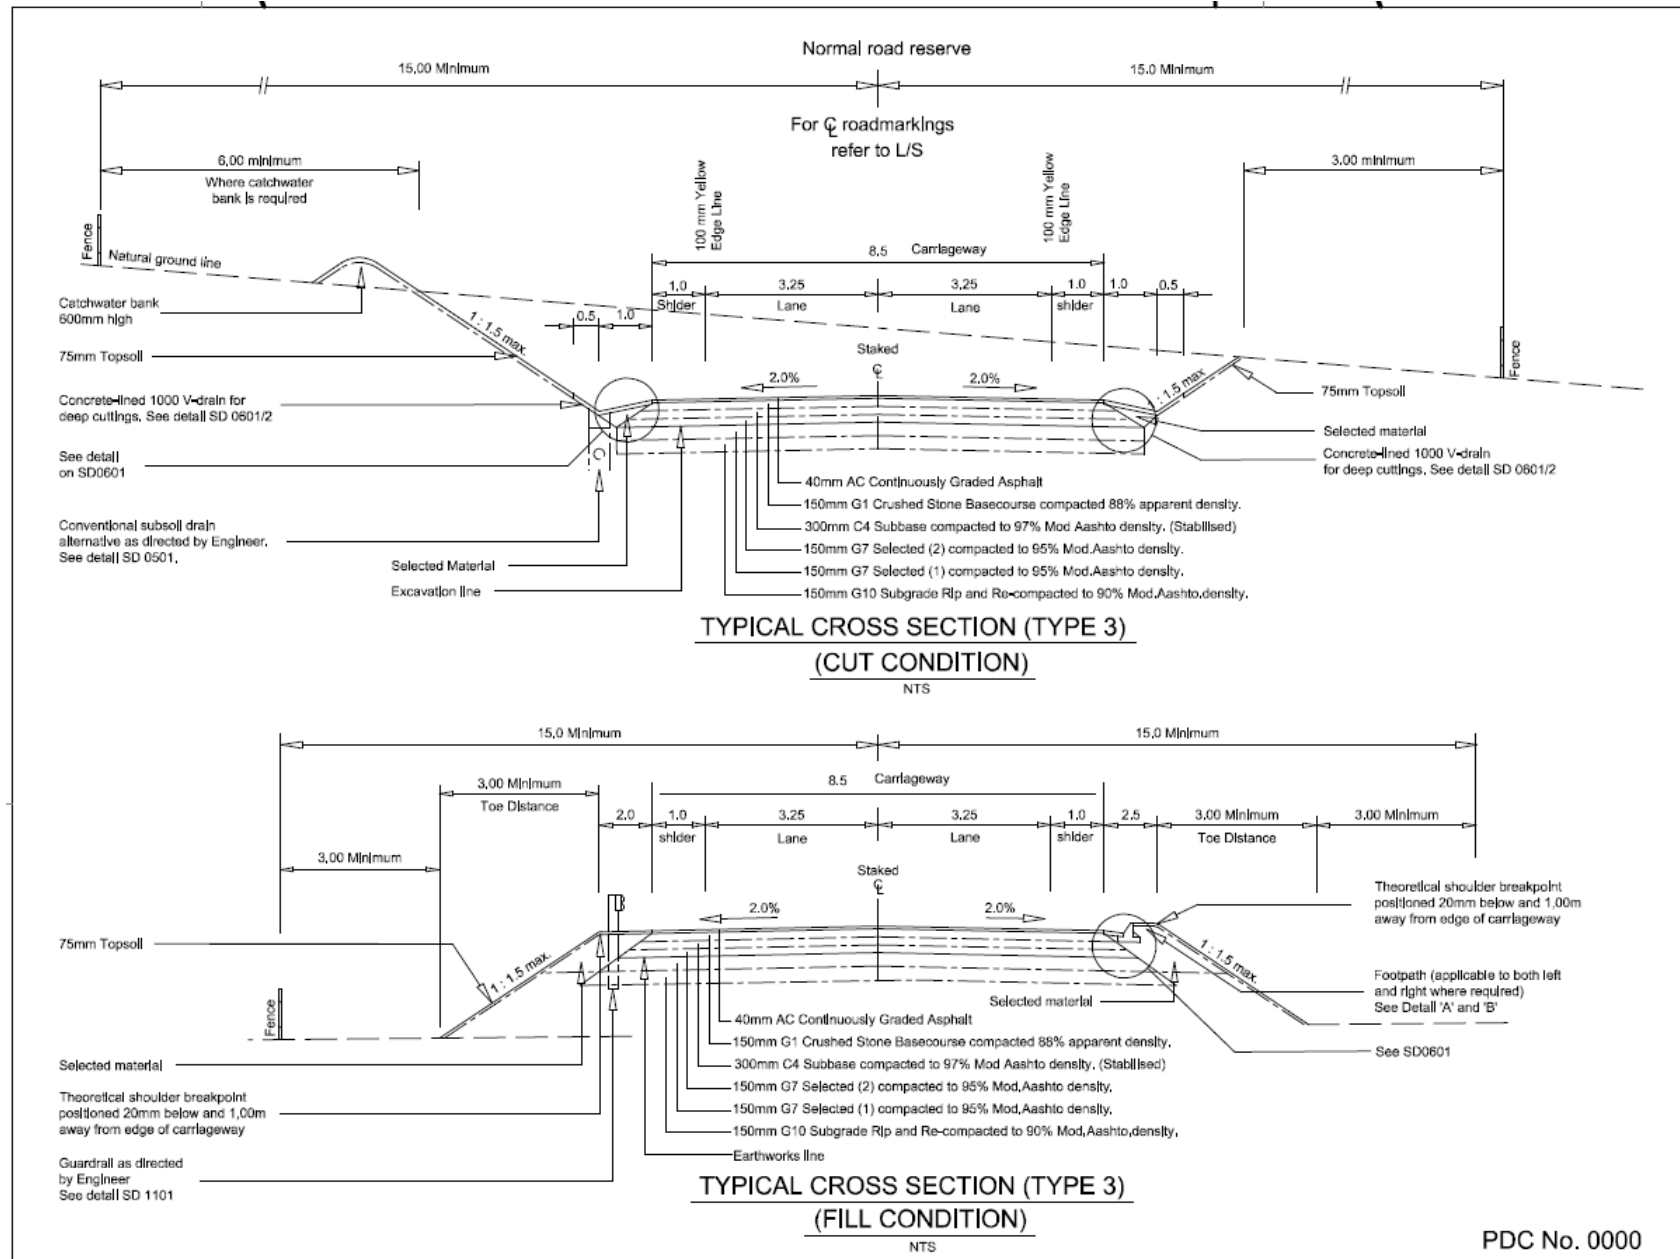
Typical cross section of the road upgrade in a cut and fill condition. (Refer to Appendix B1 for the full design drawing)
